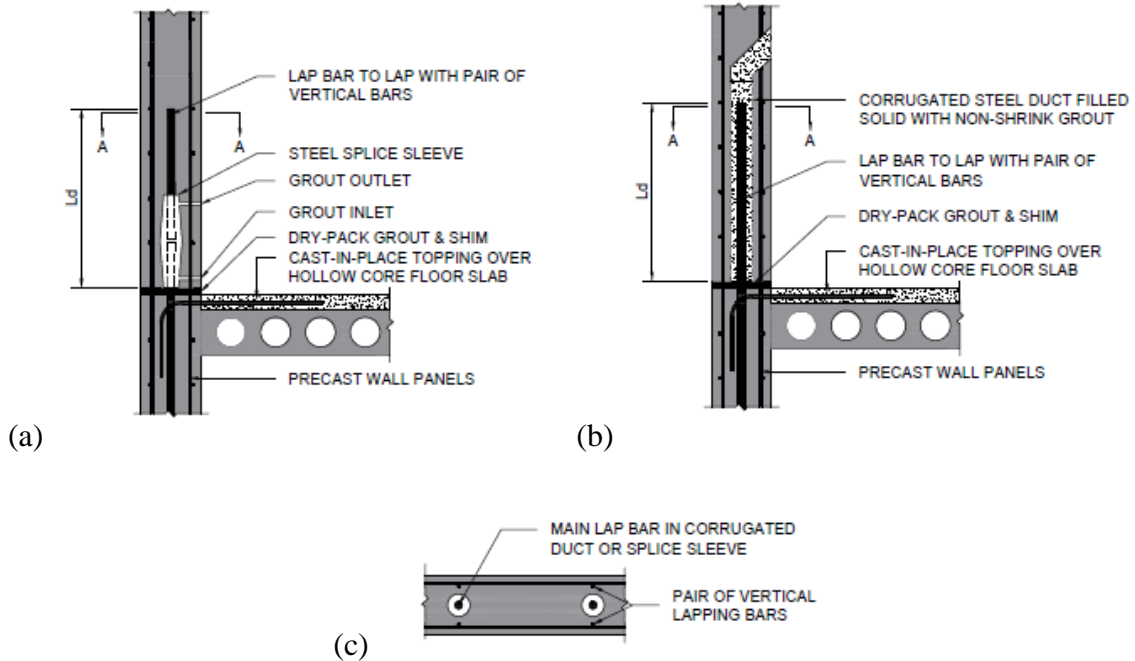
Emulative precast wall connections using: a) grouted splice sleeve, and b) grouted dowels; c) Section A-A.
